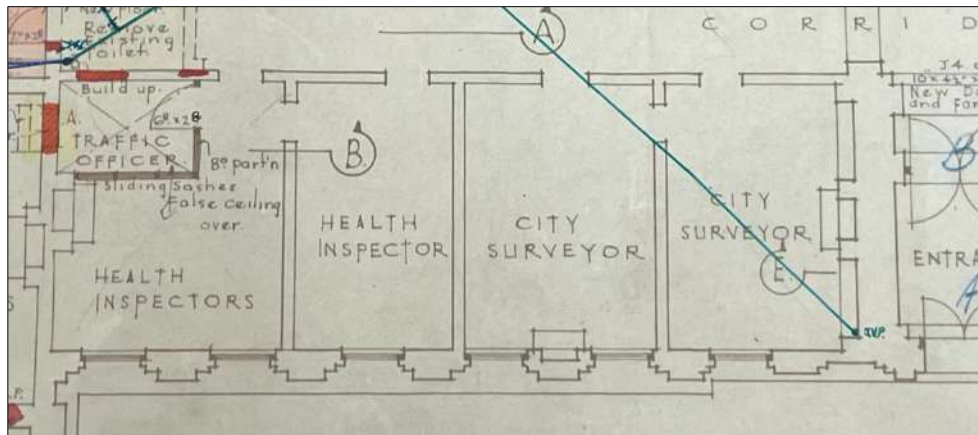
1938 floor plan showing the former lounge divided into a series of offices.
